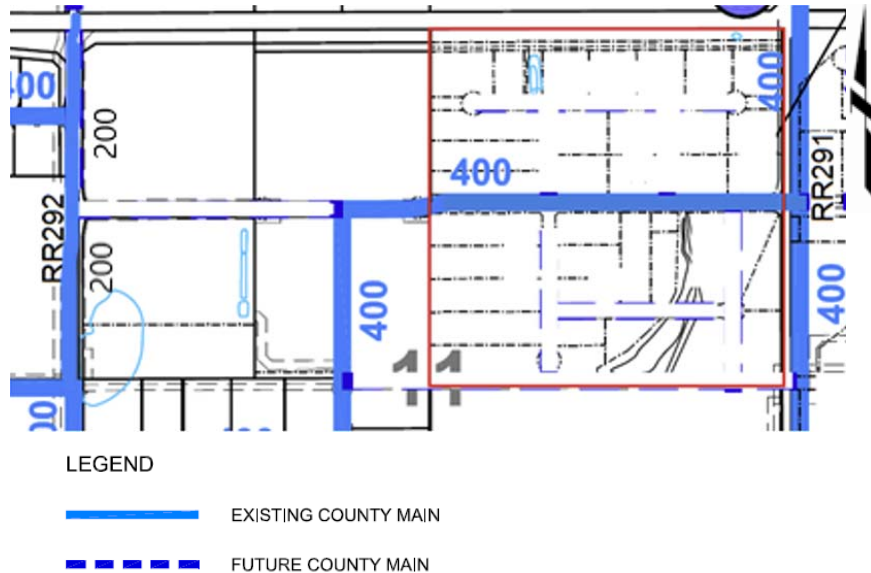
Water Mains, Balzac Master Potable Water Plan Update - (MPE Engineering Ltd. 2014, Adapted by KBES Ltd.)
